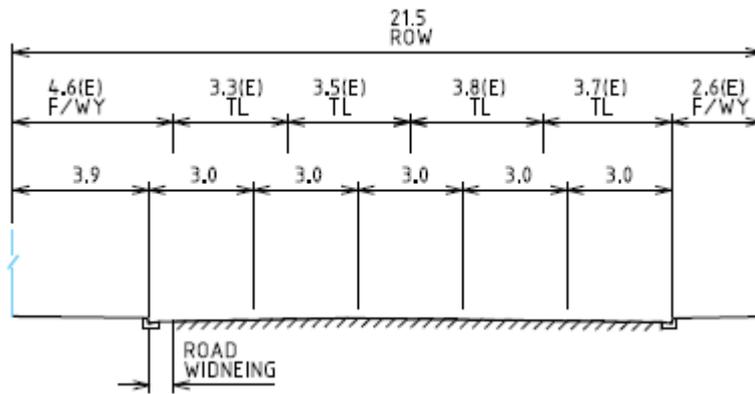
Indicative Cross Section Between Commercial Road and High Street
